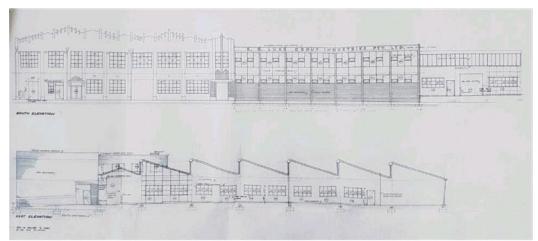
1965 drawings – the south and east elevations showing the two-storey 1937 Art Deco facade and the proposed section to the east (right) (PROV, 12 March 1965).
